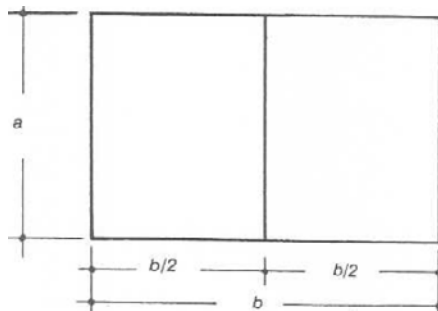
General geometric plan features of the double-containment tanks considered for the study.
